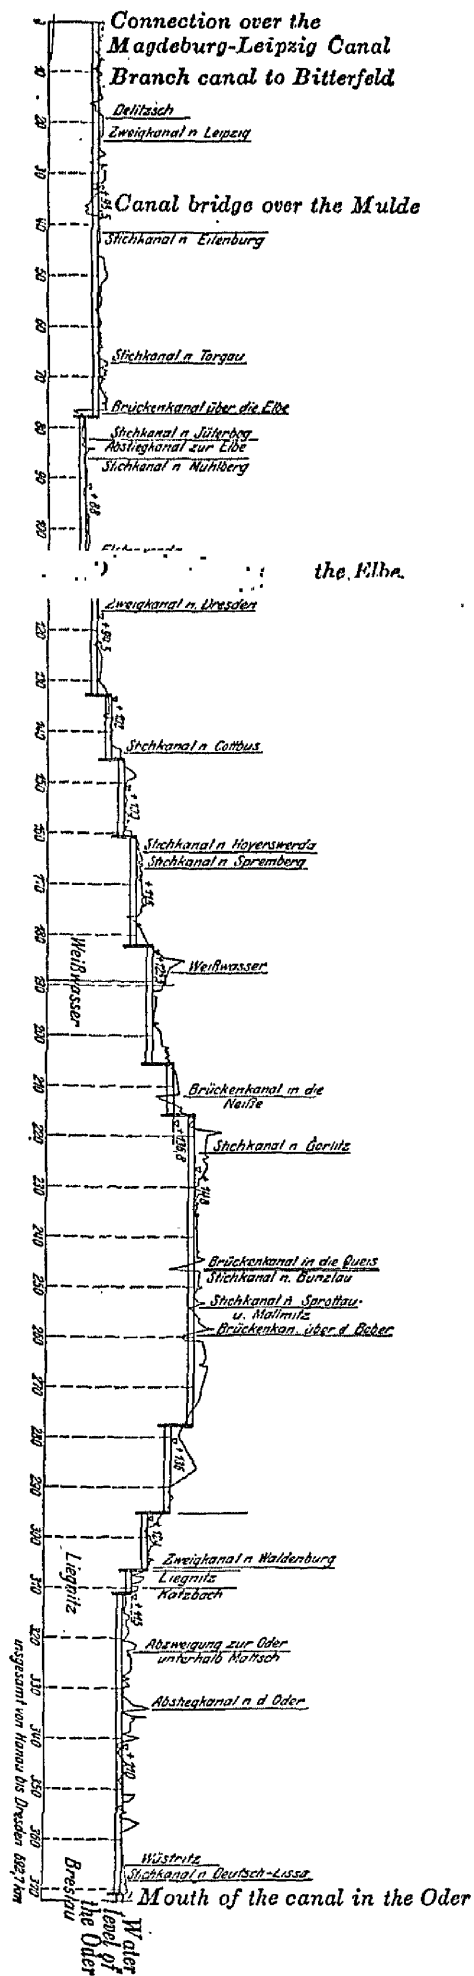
Elbe-Oder-Danube Canal plans. Profile
